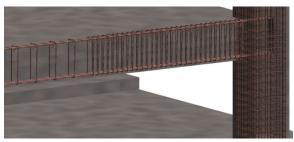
Modelling Concrete and Reinforcement Using Revit.
